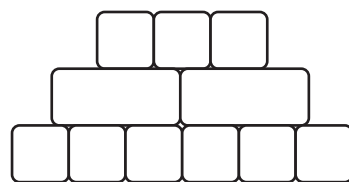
Sandbag Wall Cross-Section, Showing Pyramid Formation
